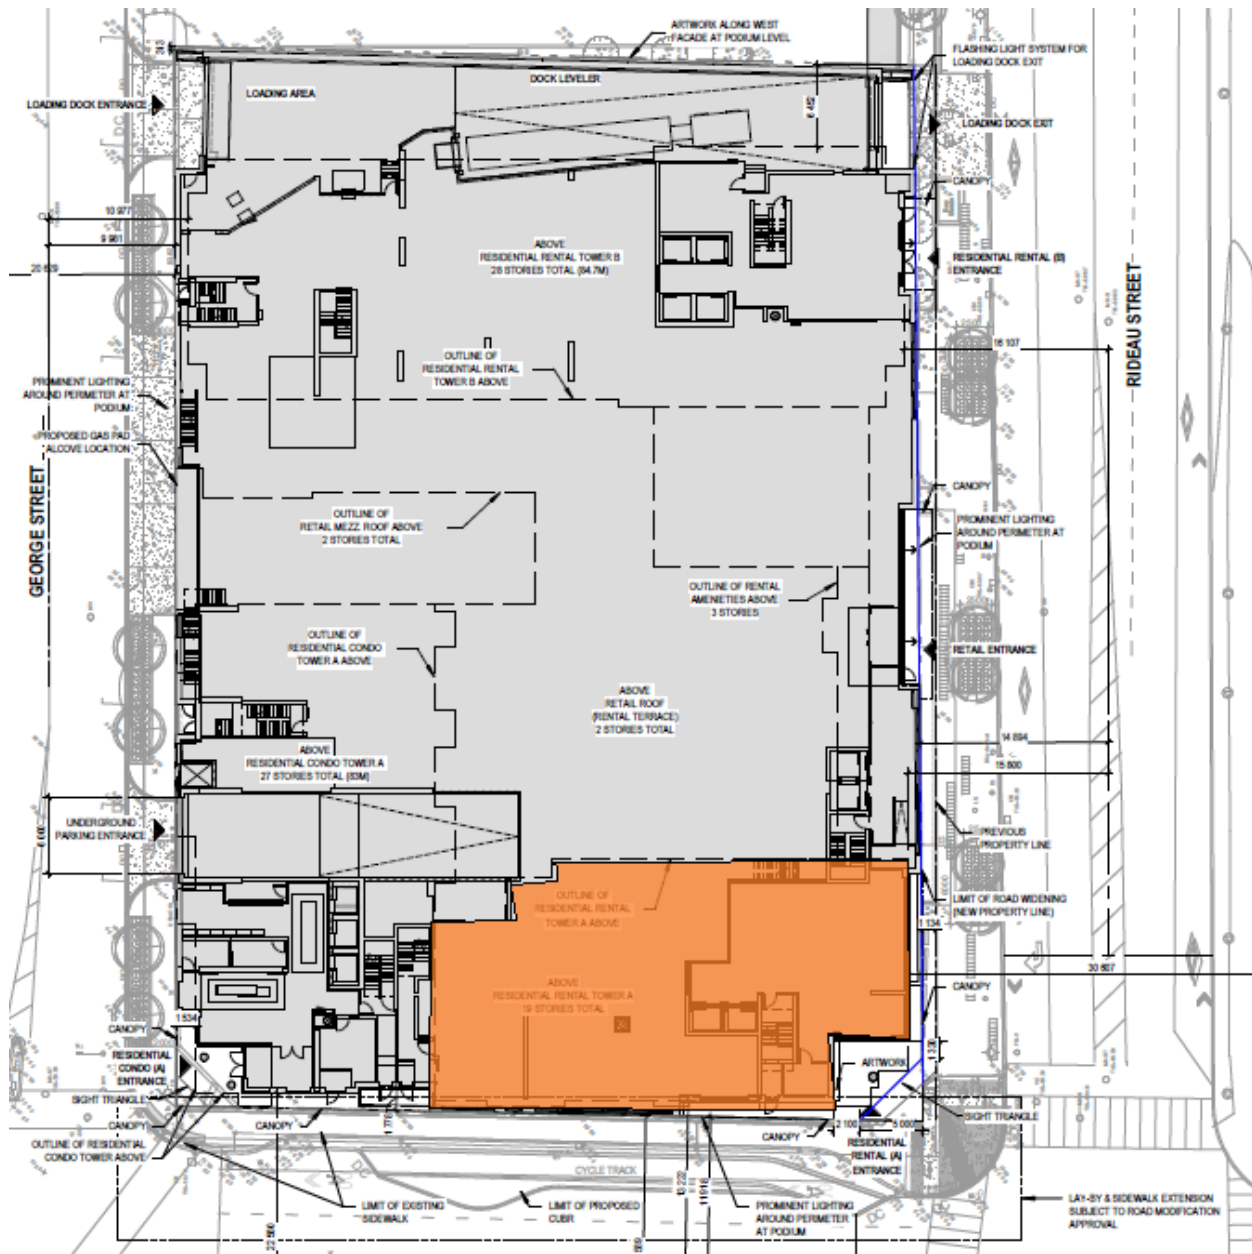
Excerpt of the revised site plan dated April 24th showing the now residential use of Tower A
